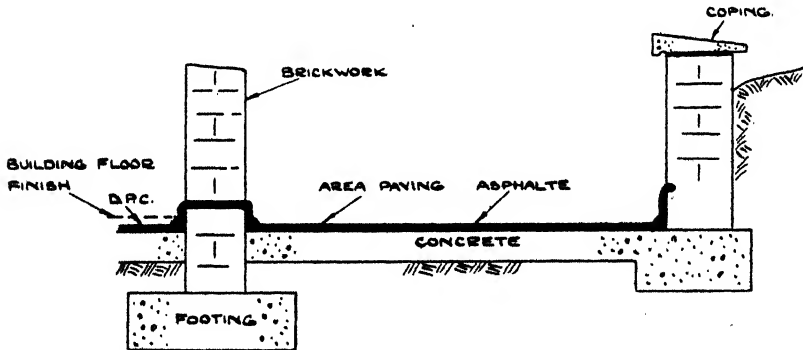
ASPHALTE DAMP-PROOFING ON PAVING TO AREA
